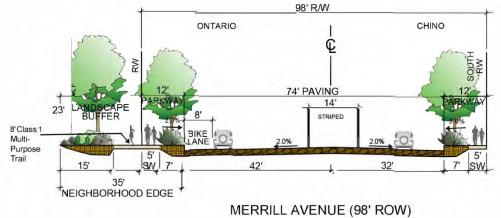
MERRILL AVENUE CONCEPTUAL STREETSCAPE
